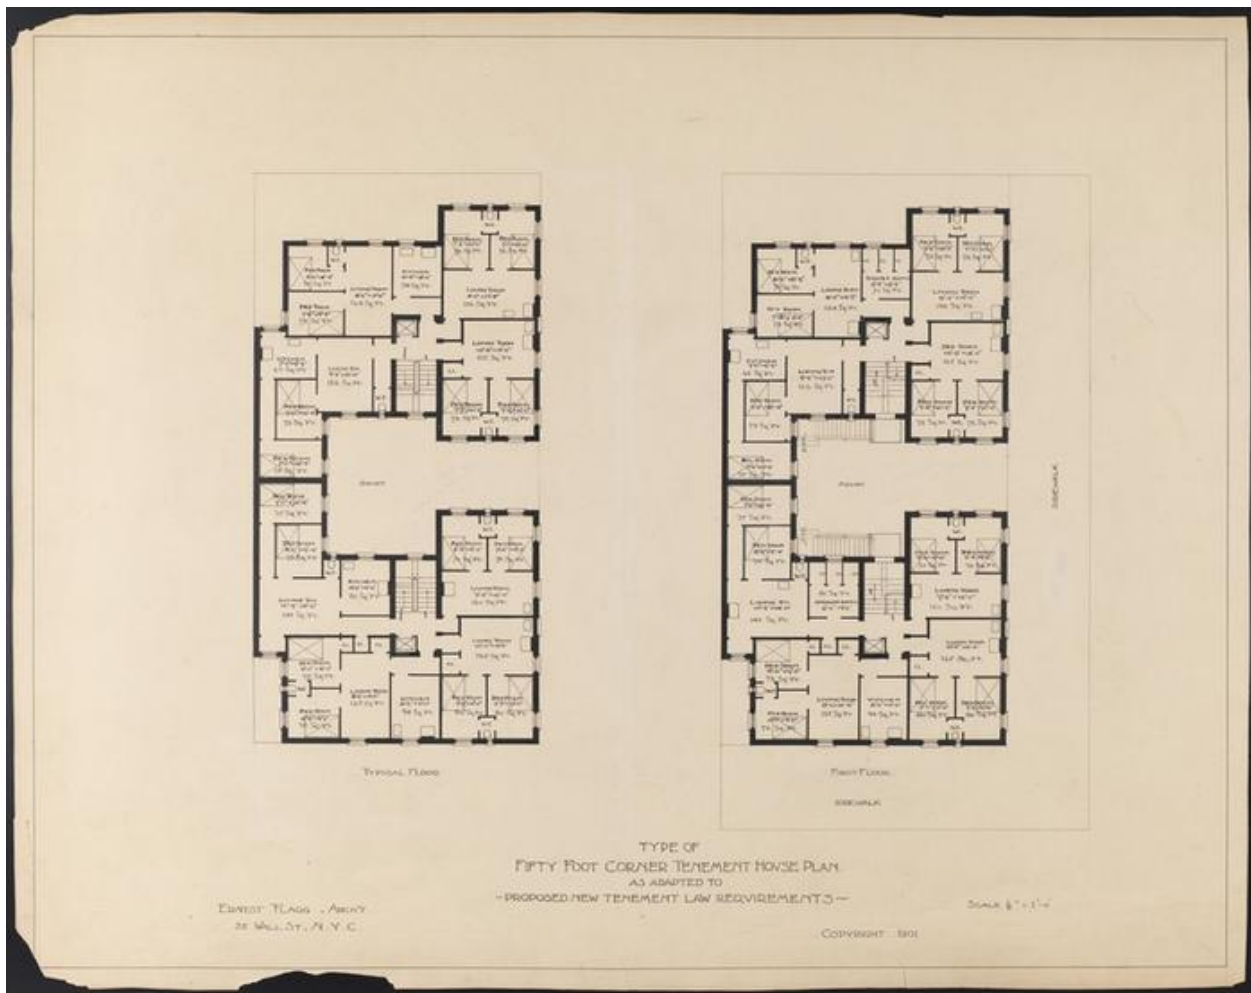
Ernest Flagg, *Type of Fifty Foot Corner Tenement House Plan As Adapted To Proposed New Tenement Law Requirements*, 1901, Museum of the City of New York, New York, NY.
